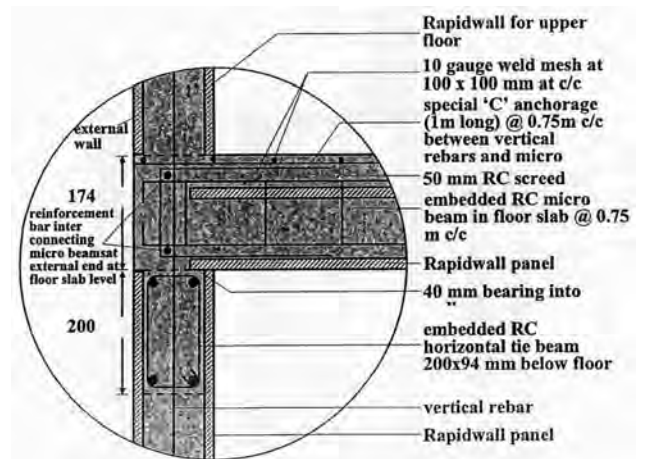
Connection between Rapidwall and intermediate floor slab at external walls
